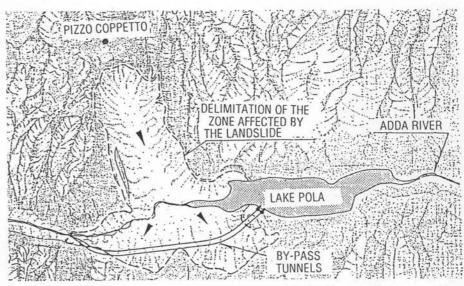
Chorography showing the planimetrical layout of the by-pass tunnels.
